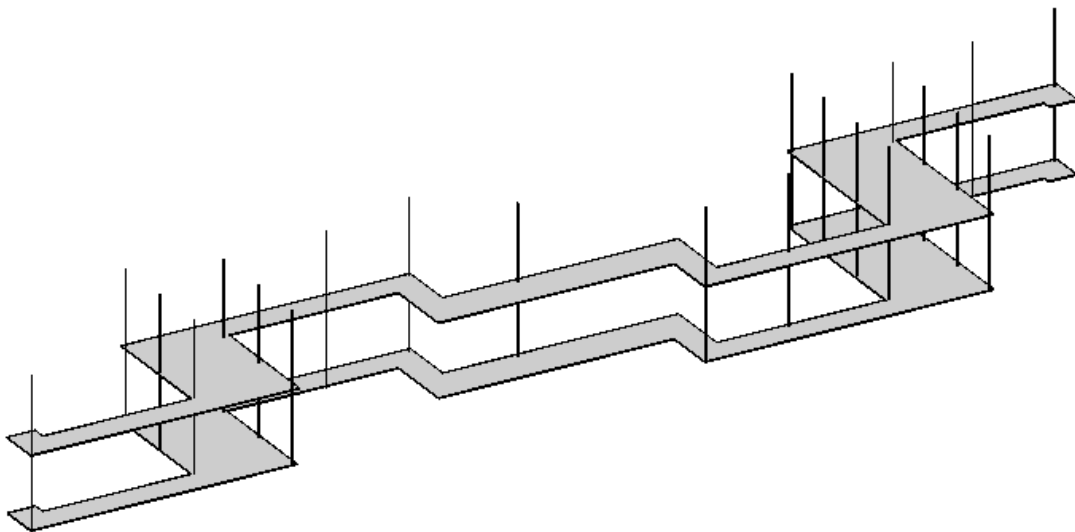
Illustration of bridge decks in the second and third storey hanging in steel members. The steel members are attached to girders lying inside the roof structure.
